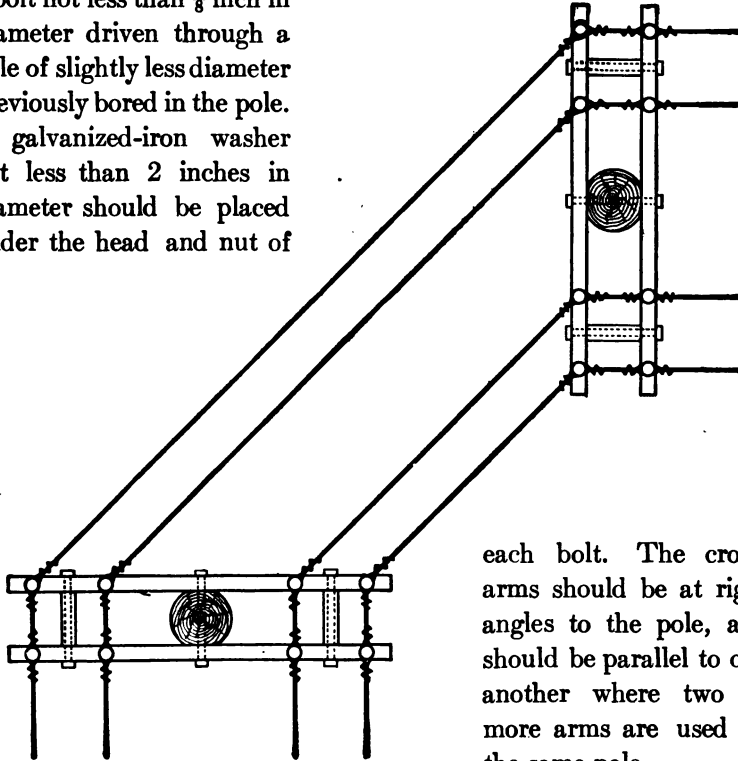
Two-Poles Used in Making Turn on Heavy Line.
